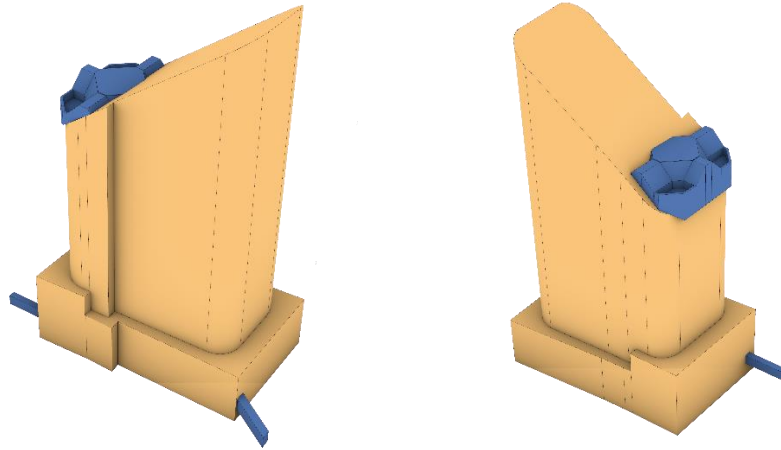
Maximum permissible Draft DCP envelope (with existing building and bridges)
